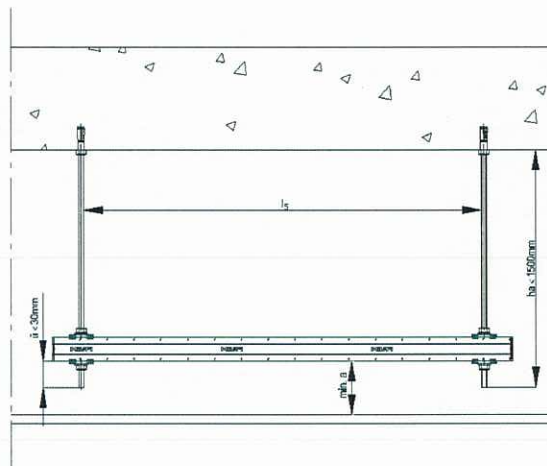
Schematic figure of suspended Hilti channel systems with MQ-41/3 above suspended ceilings
